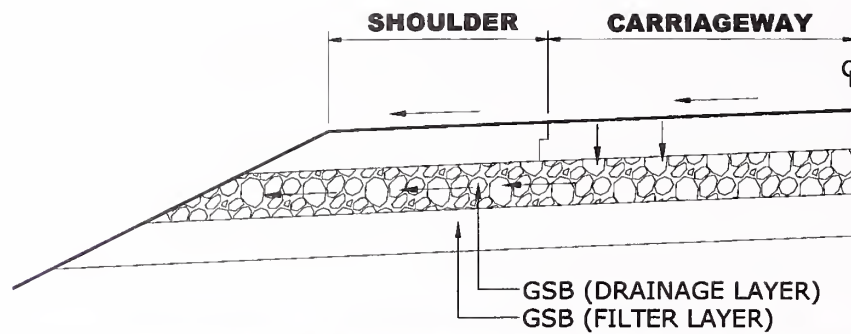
A Pavement Section Showing Day Lighted Drainage Layer
